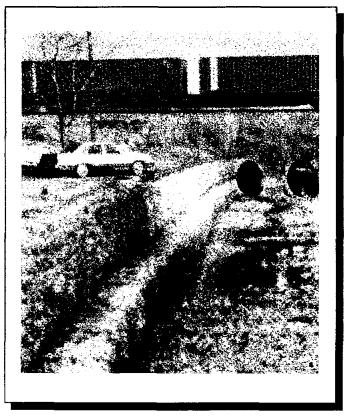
Gabion Channel Upstream of M.K.T. Railroad
